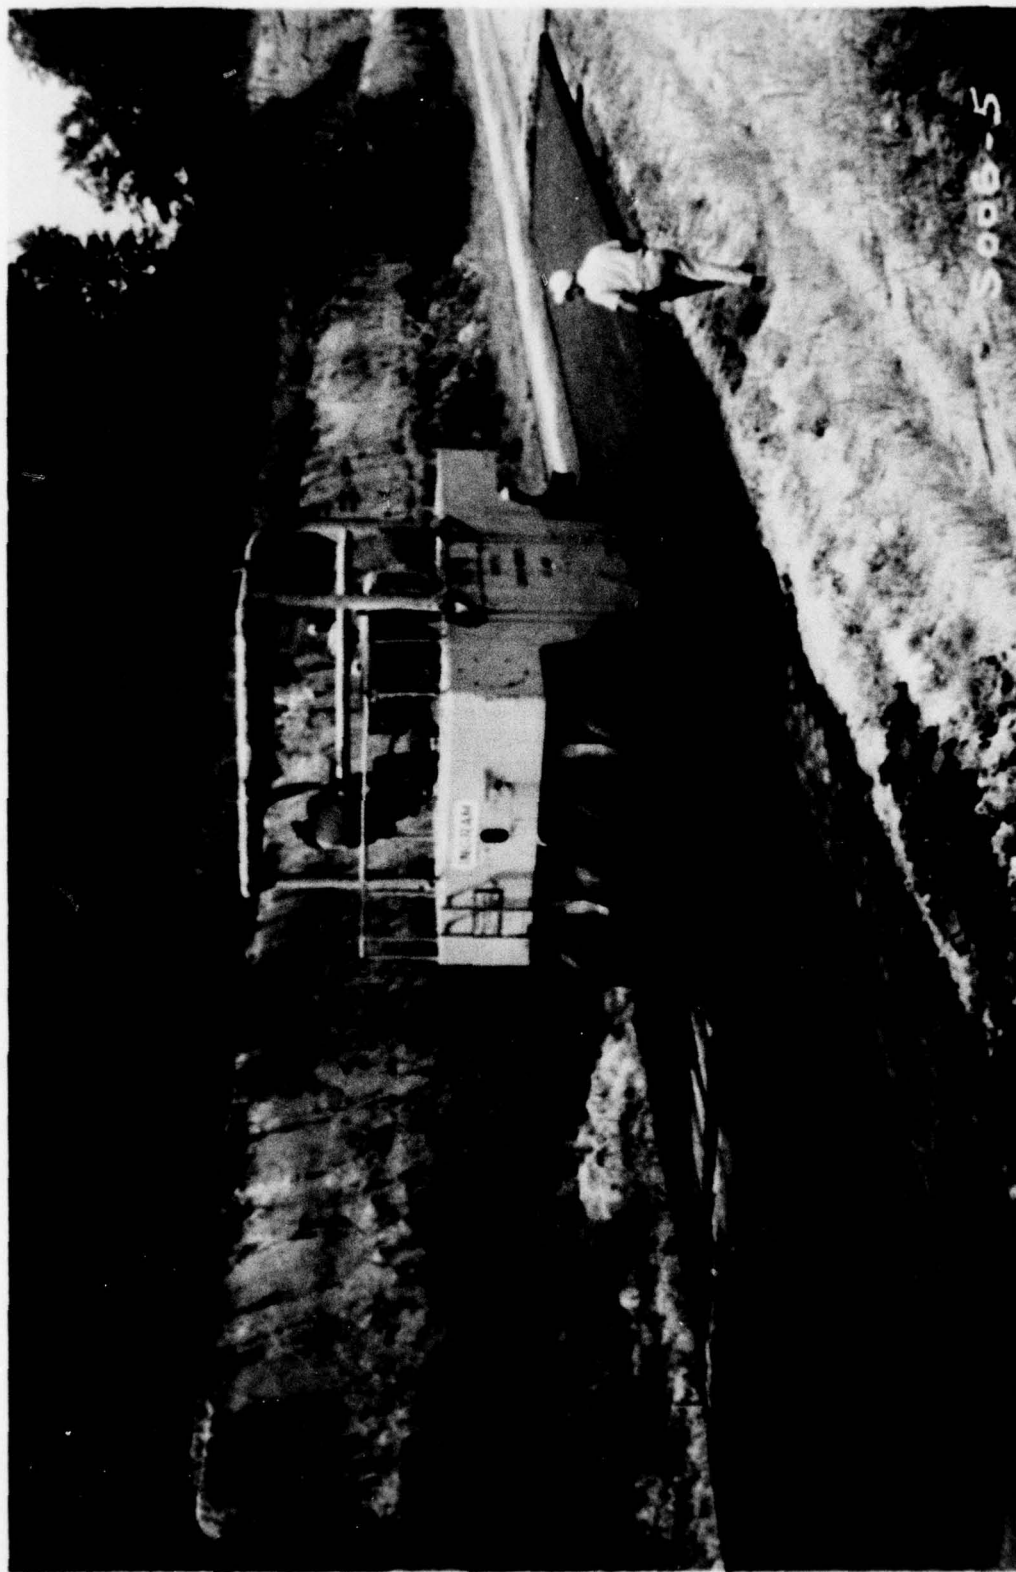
Final compaction of asphaltic concrete with a 47,000-lb rubber-tired roller
